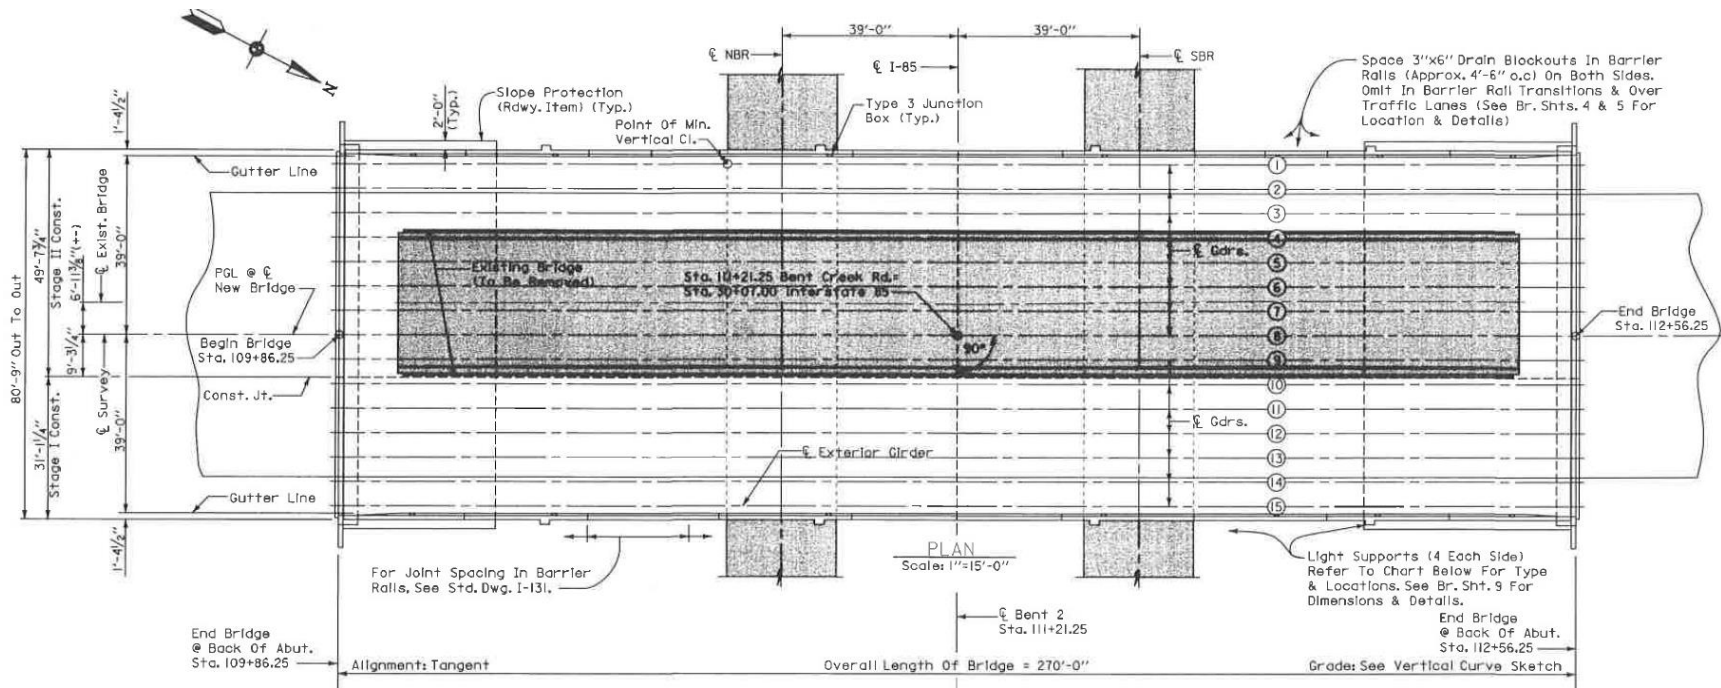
Lee County bridge plan view (ALDOT 2006)
